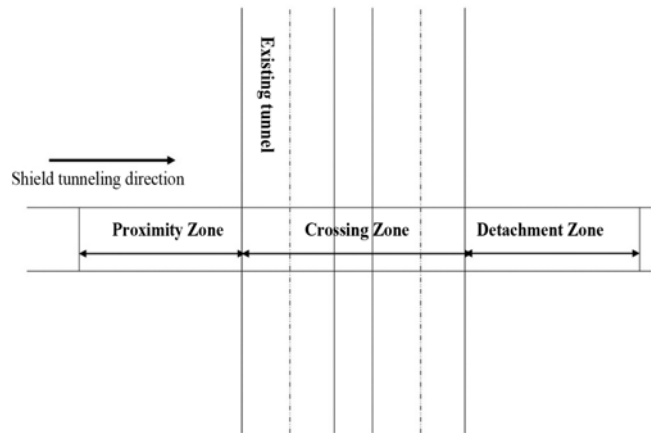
Plan of the Interaction Zone when Shield Tunnel Crossing the Existing Tunnel
